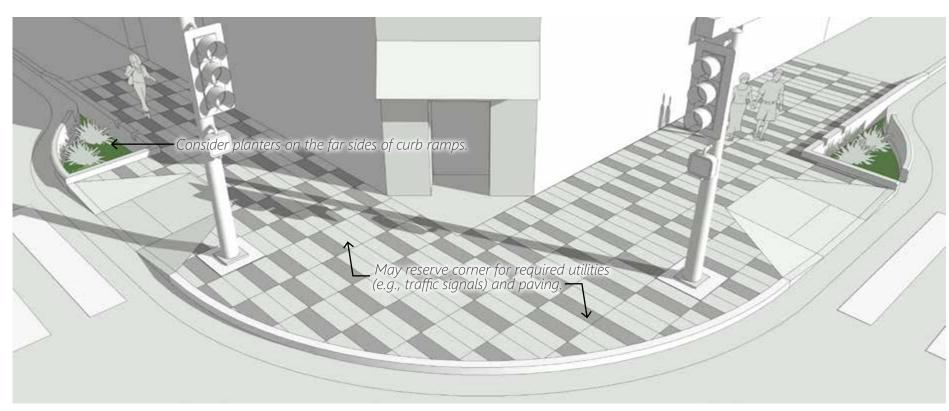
Intersection Corner Curb Extension Planters at a High-Speed and Volume Street.
